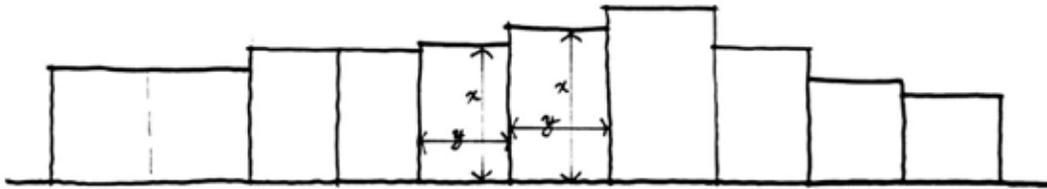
Building Width Articulation Example, Stillwater Design Manual, 2006.
